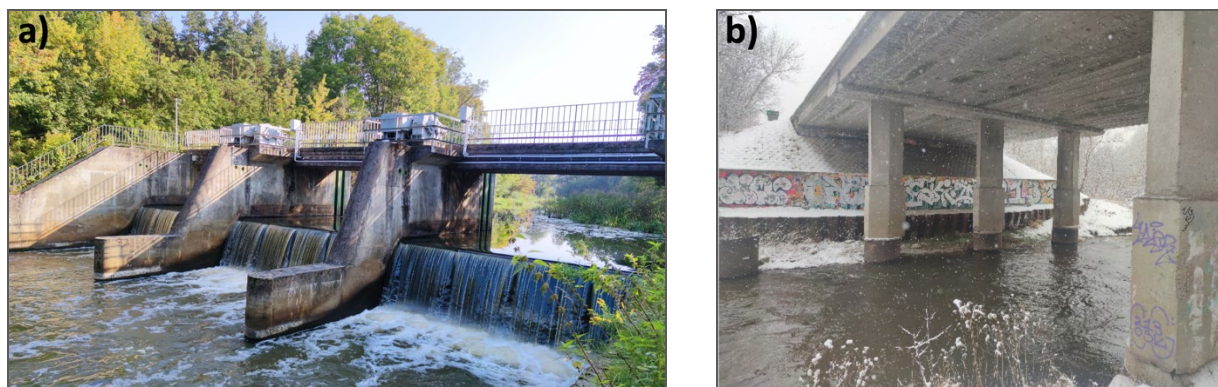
Examples of concrete hydrotechnical structures: a) weir on Świder river, b) bridge piers on Świder river
